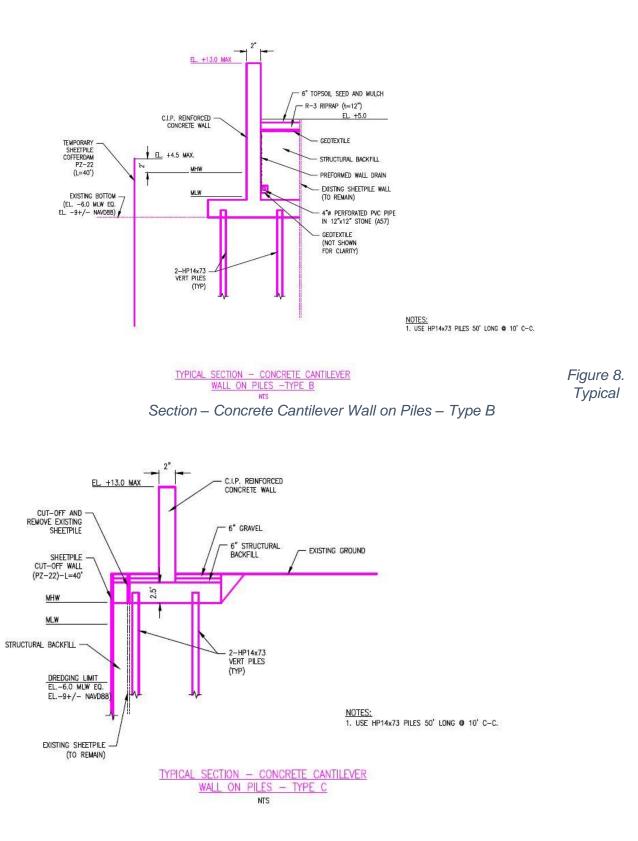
Typical Section – Concrete Cantilever Wall – Type C
